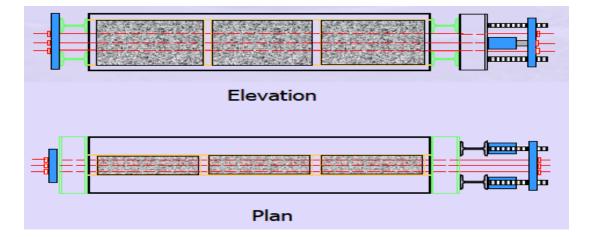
Elevation & Plan showing strands profile of I Girder after casting concrete ("Referred from Prestressed Concrete Structures by Dr. AK Sengupta and Prof. Devdas Menon")
